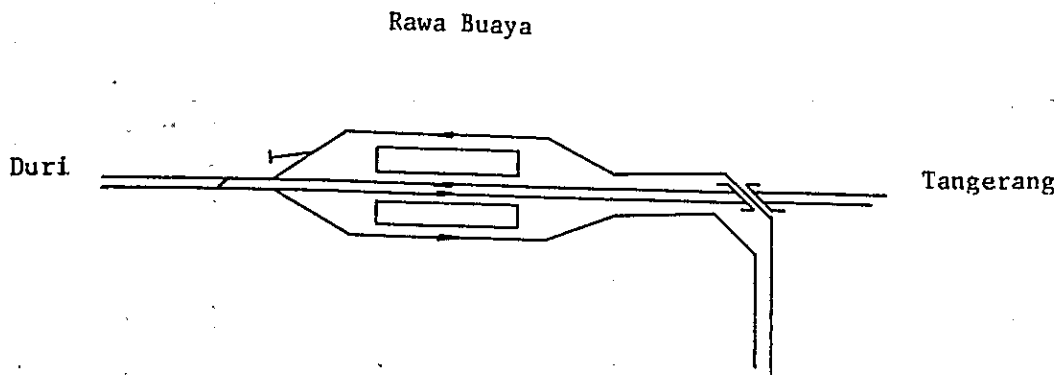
Sketch of Track Layout (Rawa Buaya)
